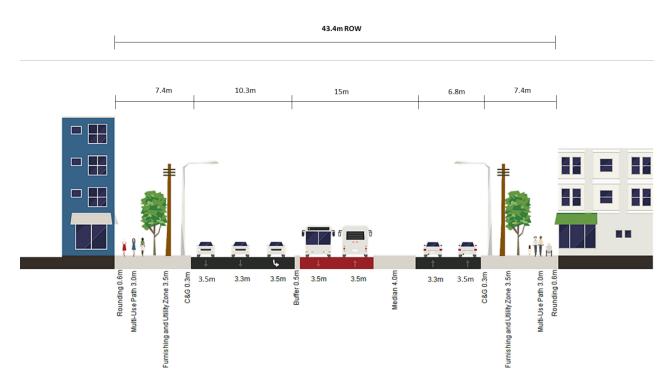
ULTIMATE VISION Intersection / Station Typical Section - Rapidway with 4 GPL with AT facilities
